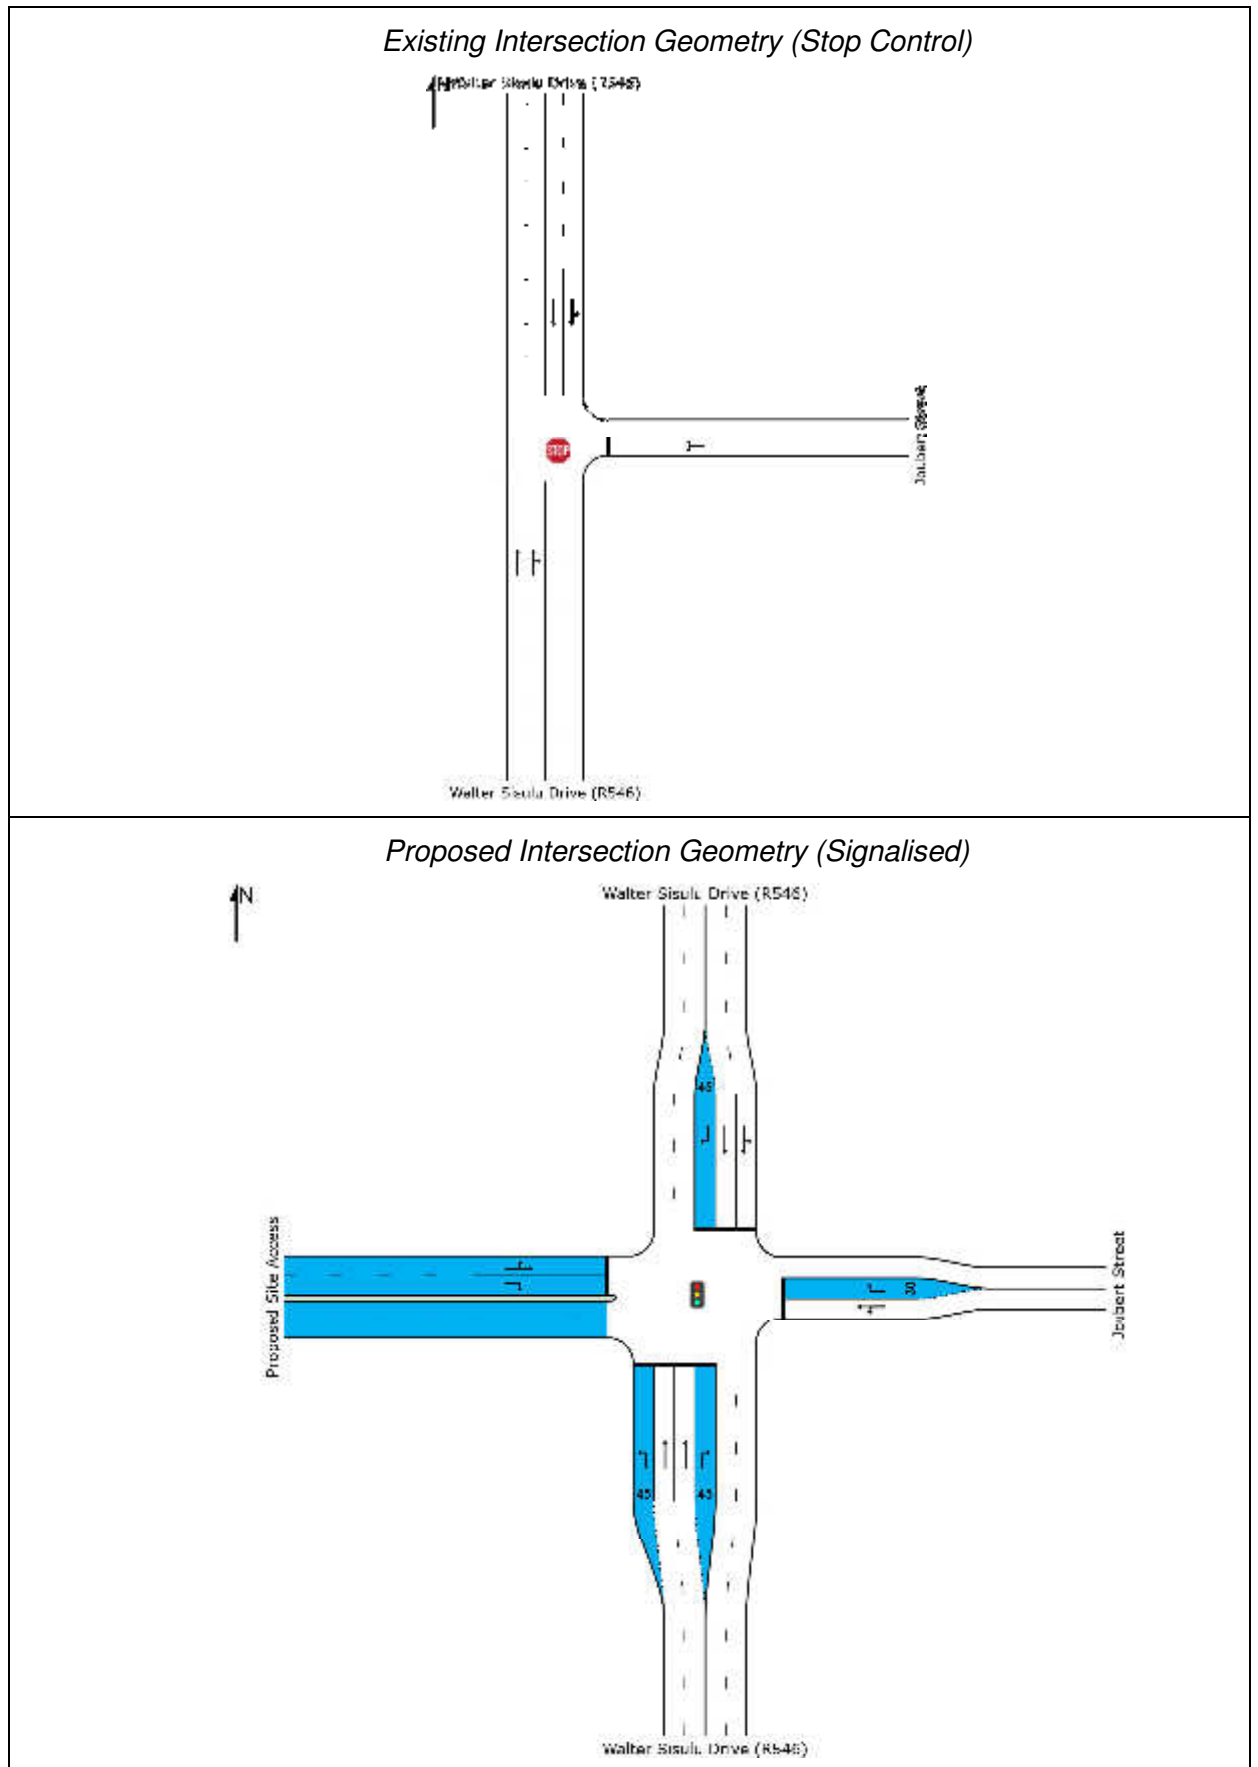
Geometry – Walter Sisulu Drive / Joubert Street / Site Access
